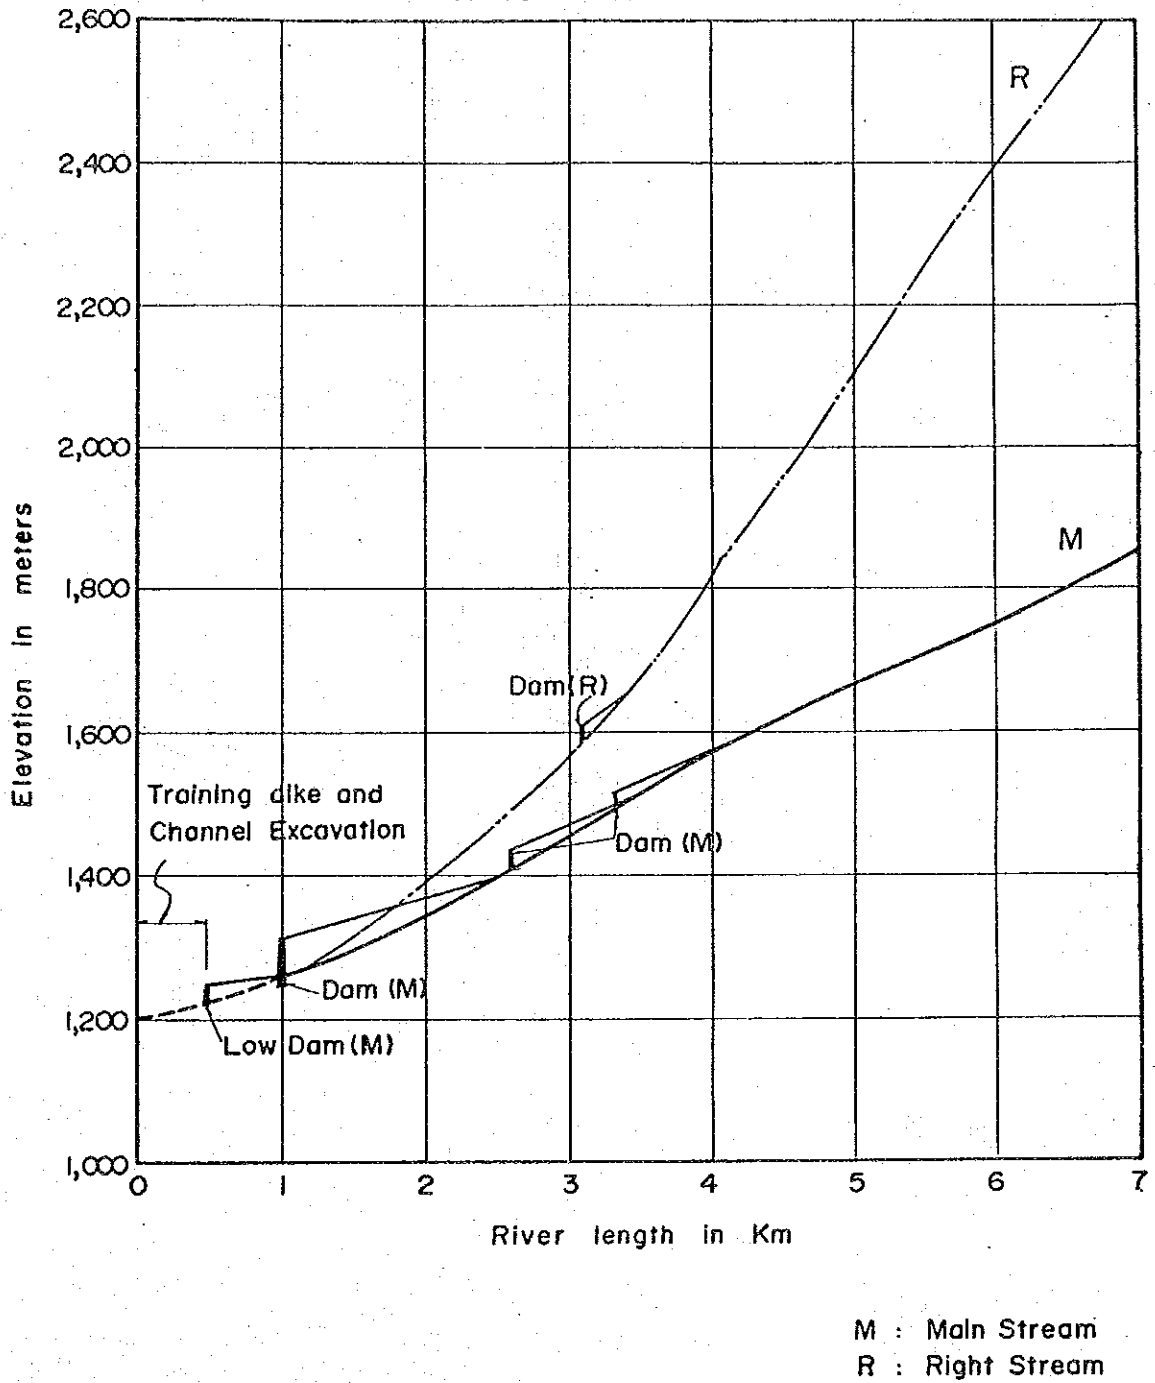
Structural Plan on Profile of Qda Rio Canchacalla (R15)
